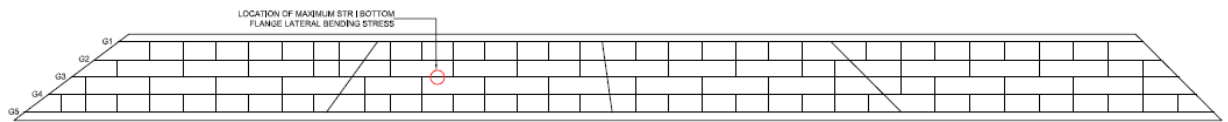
Maximum STR I bottom flange f_ℓ in Girder 3 of Bridge16.
